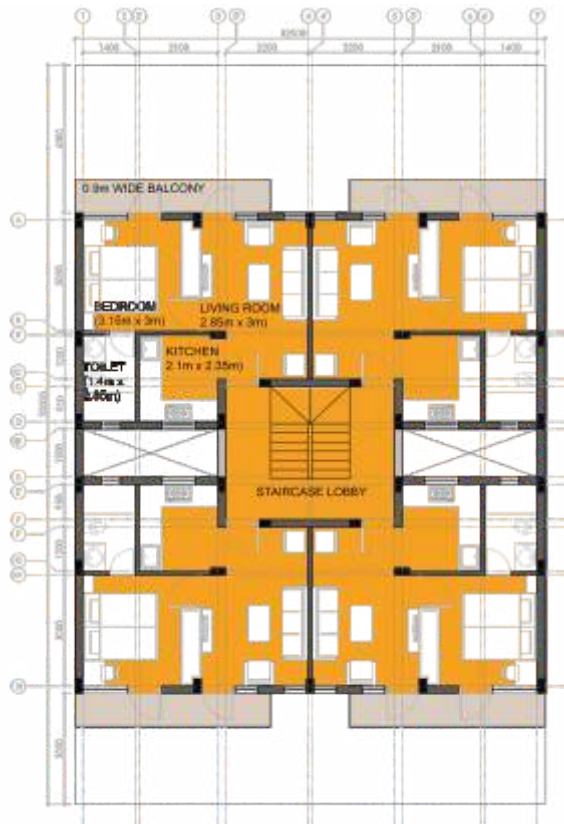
Typical ground floor plan of Type 8A dwelling unit
